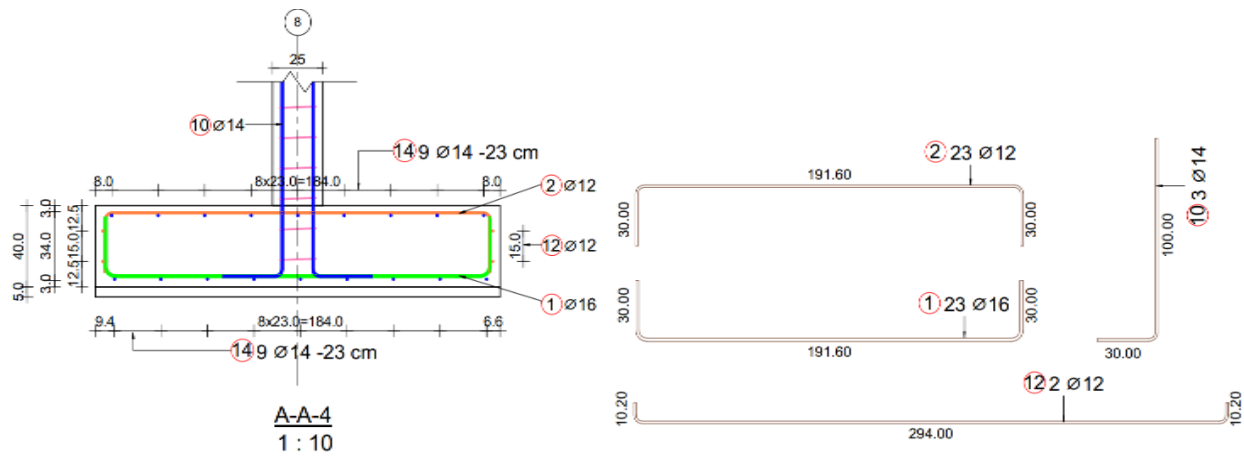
75. Transversal steel reinforcement plan of the combined footing
